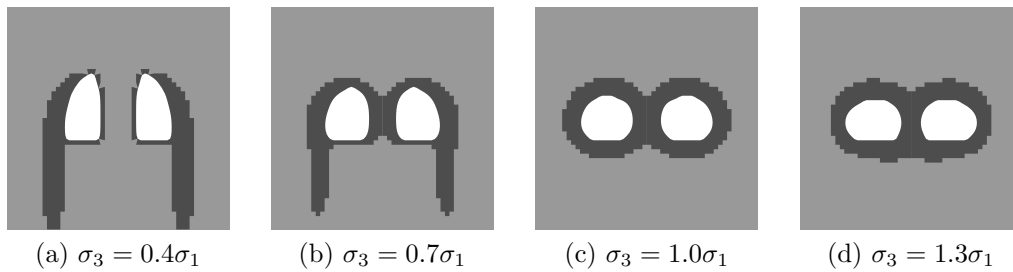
Optimum shape and reinforcement of two parallel tunnels with traffic load.
